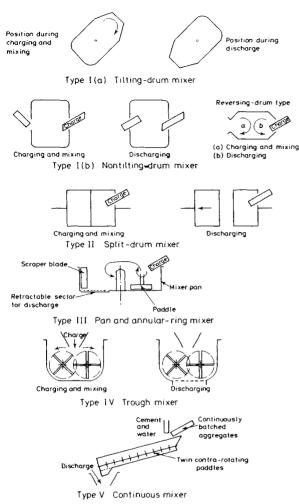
Concrete mixers. (*Courtesy*: John Laing and Sons Ltd)
